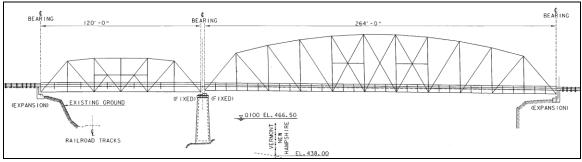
Elevation drawing from bridge rehabilitation plans (NHDOT 2000).
